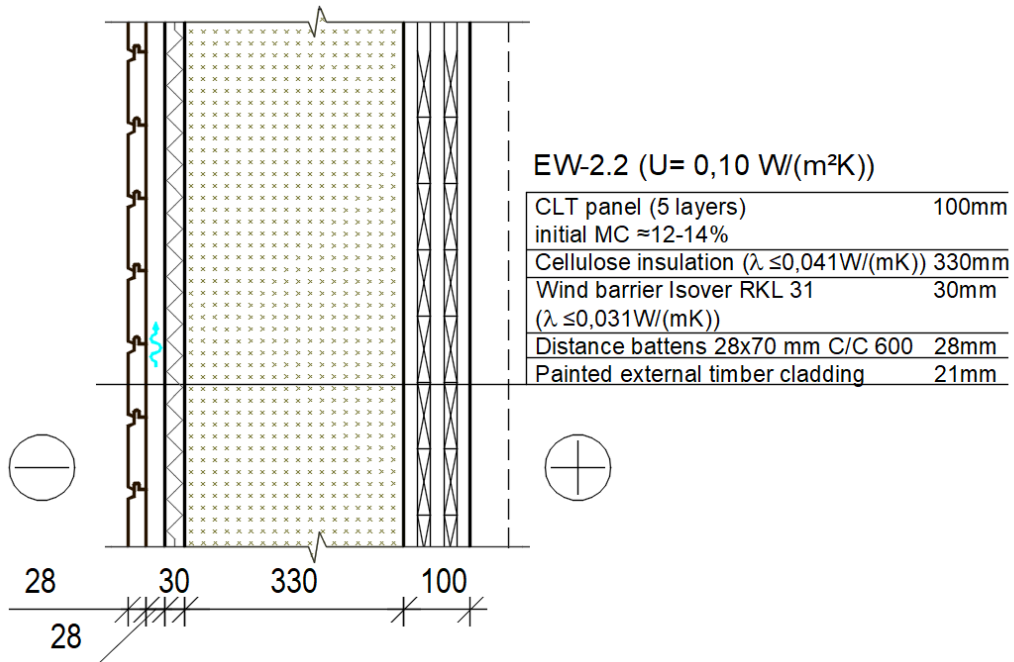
Wall type EW-2.2 (Technical drawing by V.Kukk, adjusted by author)
